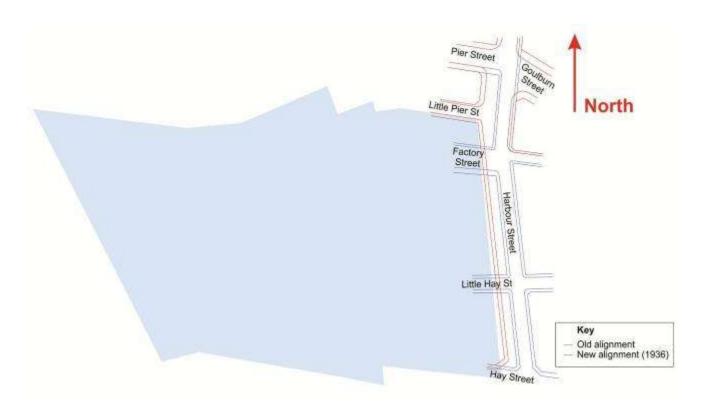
Tracing of council plan showing the widening of Harbour Street in 1936. Road reconstruction plan: Widening and reconstruction Harbour Street from Hay Street to Pier Street, 21 Feb 1936, Item E1-452/4, Series 473, City of Sydney Council Archives.
